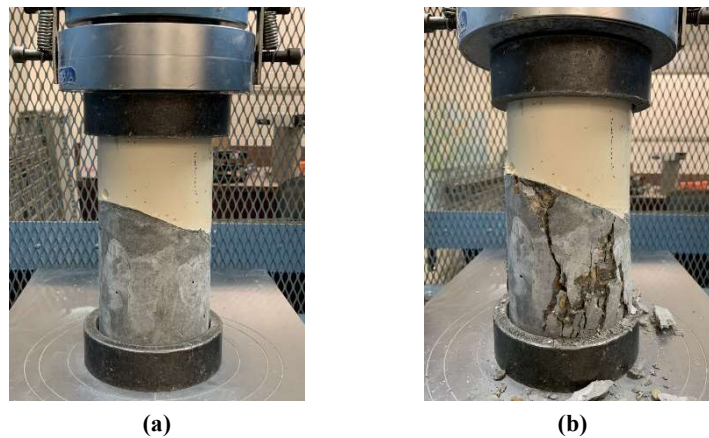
Slant shear test: (a) specimen during testing and (b) specimen at failure.
